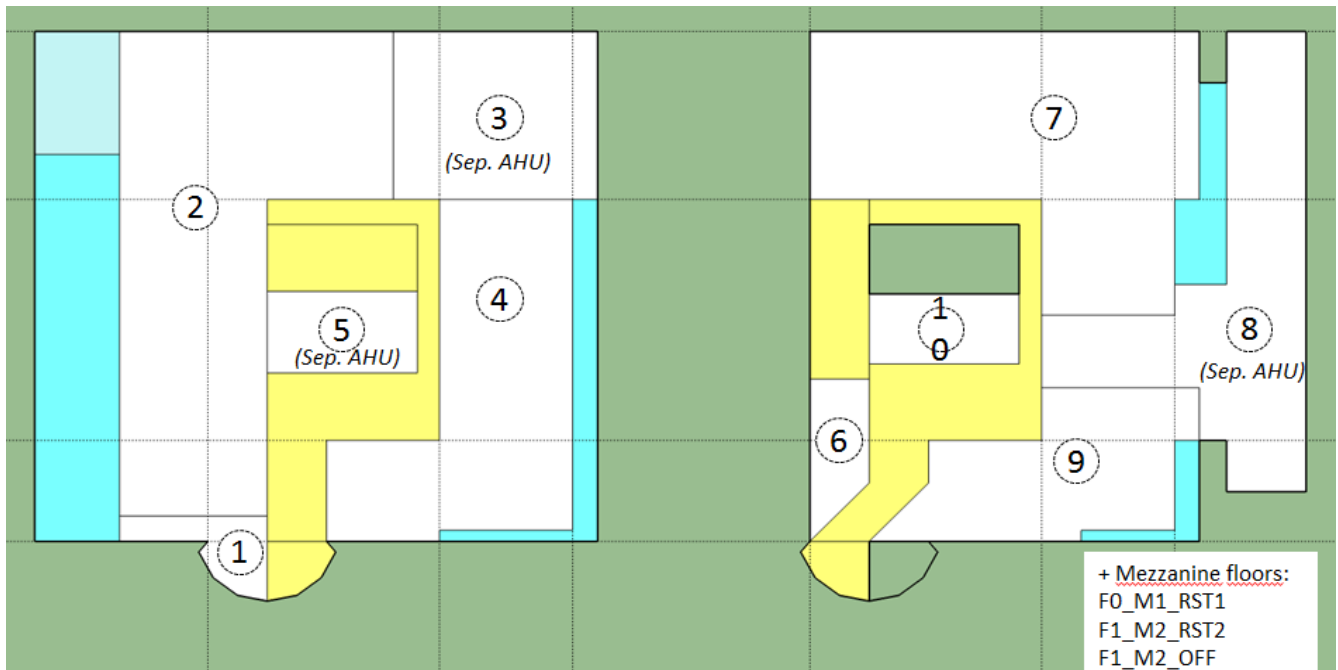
Diagram showing the simplified modelling layout still respecting the external facades and internal floor area of each shop/retail zone. This layout is also used for heat maps (see next chapter).
